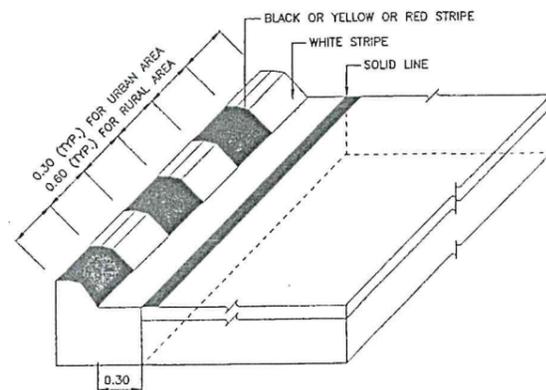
DETAIL OF CURB AND GUTTER OR CURB AT RAISED MEDIAN
